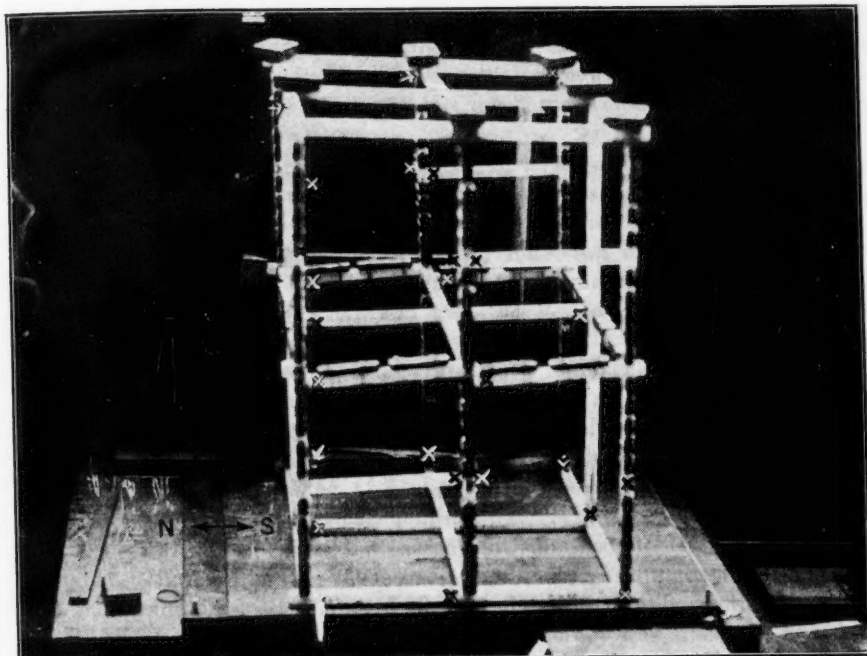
MECHANICAL MODEL OF A WOODEN FRAME BUILDING (x INDICATES POINT OF BREAKDOWN).
